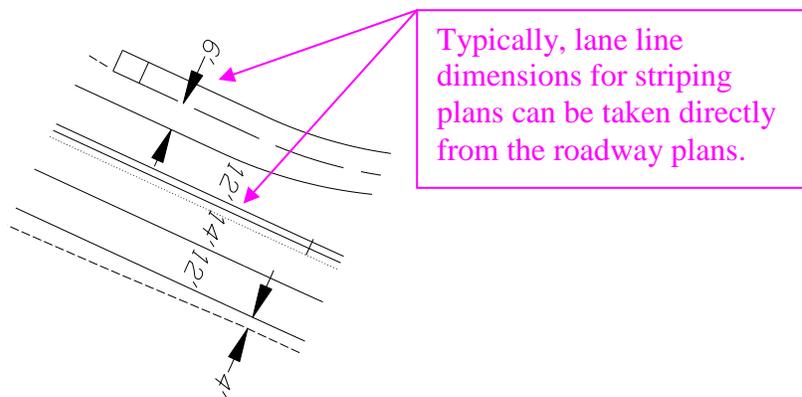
Lane Line Dimensions Shown in Pavement Marking Plans
